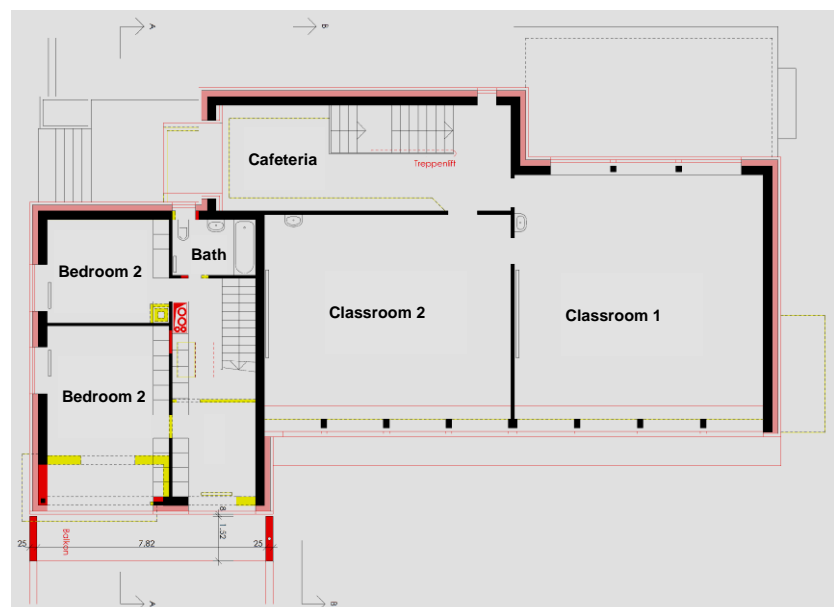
1st floor plan of school building with caretakers apartment (left). Red: new construction / building envelope, yellow: removed construction (source: Bruno Thoma)
